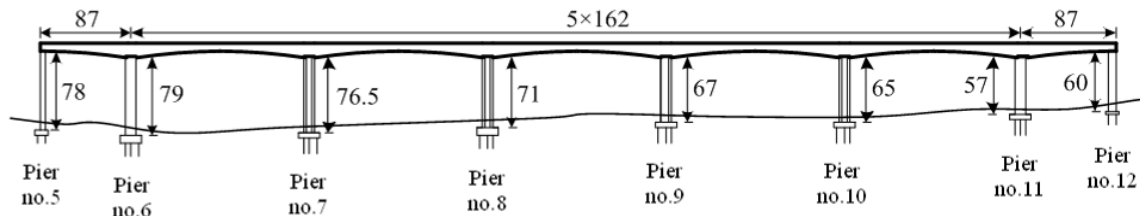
Main spans of Jinghe Bridge (dimensions in m)
